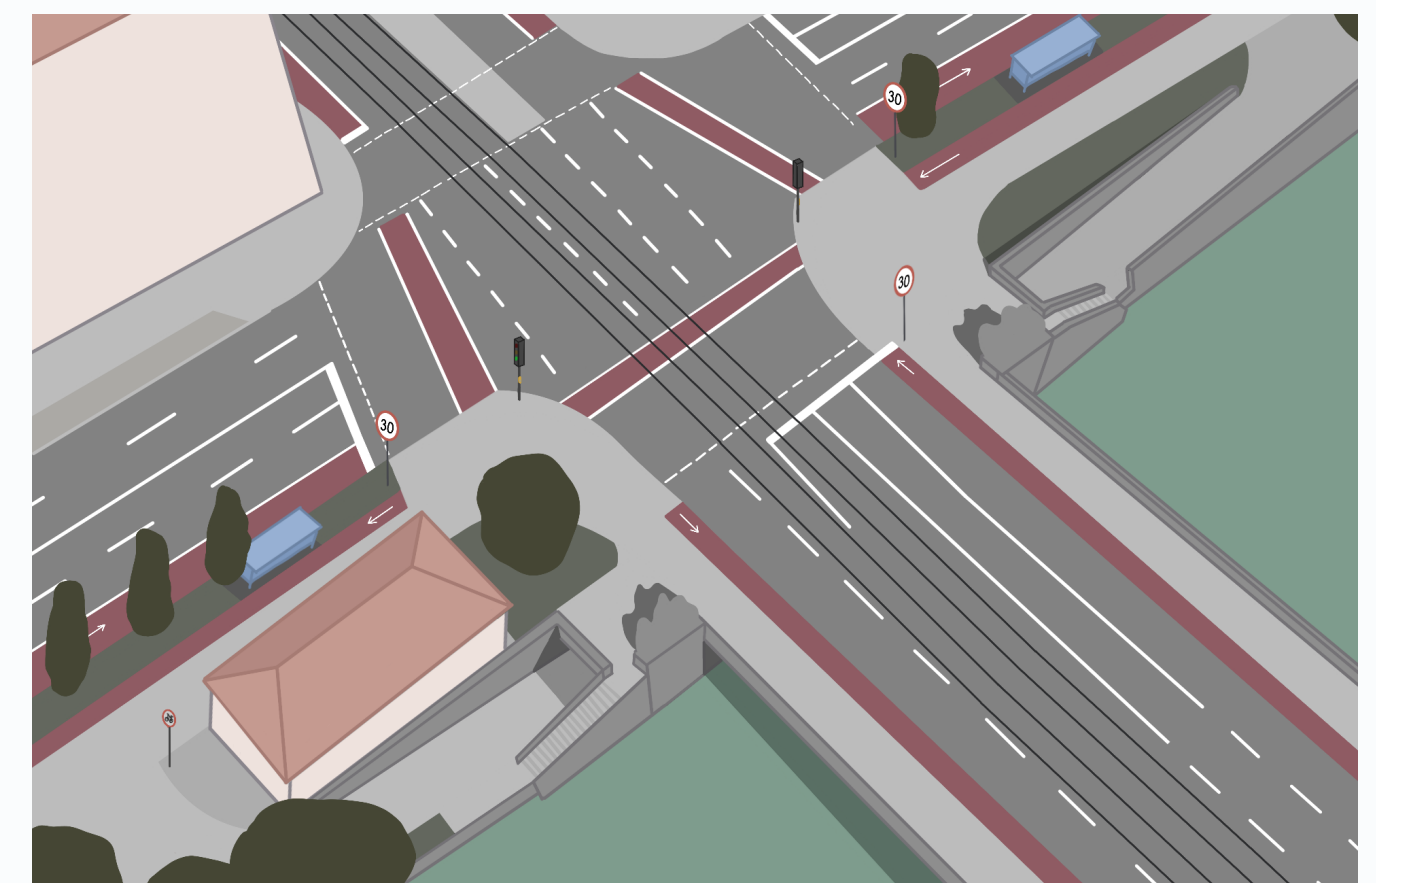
Reichenbachbrücke - Stage 1 (own work).
